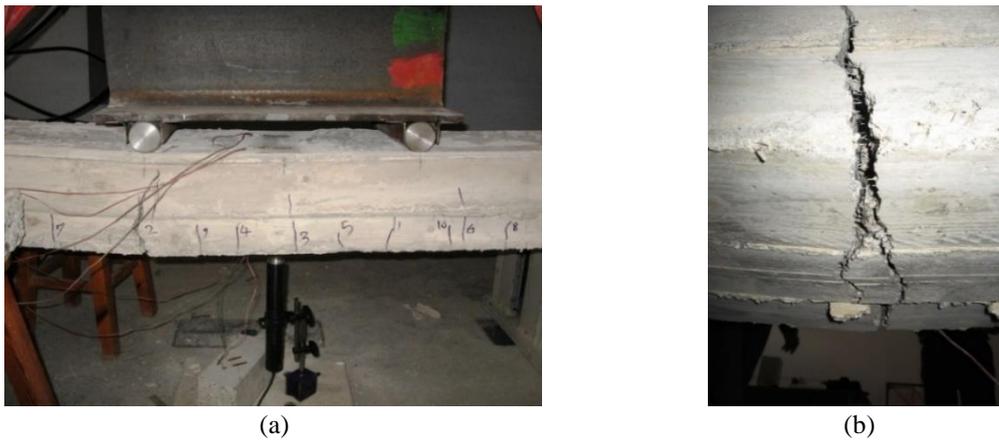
beam specimen after test (a) general cracks view (b) major flexural crack
